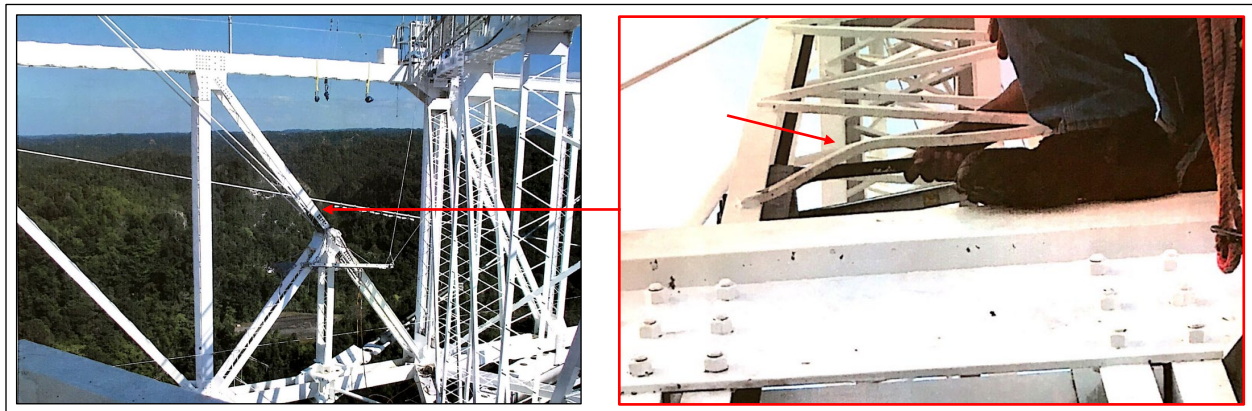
Damaged truss member lacing near outrigger 12 east backstay connection to platform on February 5, 2010.
